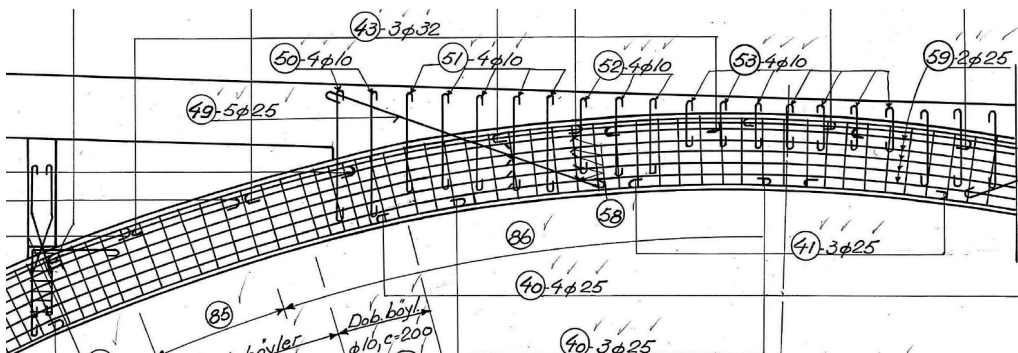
[2] The transition zone between the bridge beam and the arch.
